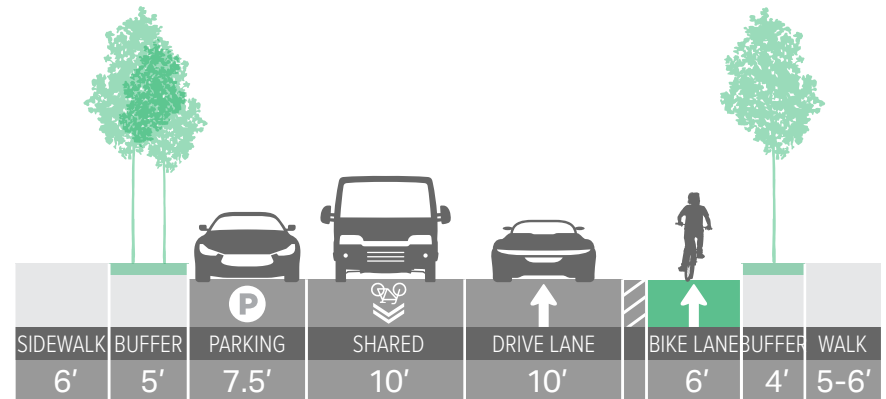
Proposed Cross-Section Crockett Street to Spring Street
